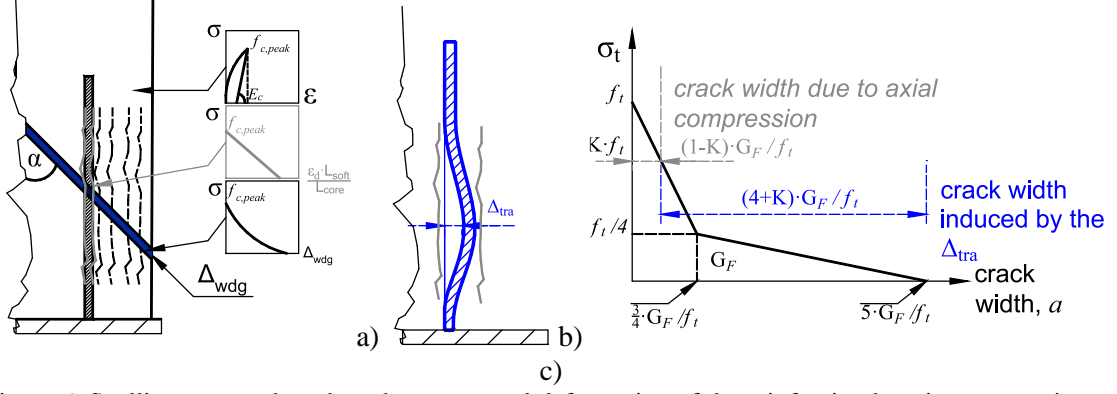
Spalling process based on the transversal deformation of the reinforcing bars in compression as formulated by Dhakal and Maekawa [32]: longitudinal cracking width due to axial compression (a), longitudinal crack width due to lateral deformations of the reinforcing bars (b) and resulting equivalent deterioration of the concrete cover tensile strength in the transversal direction (c).
